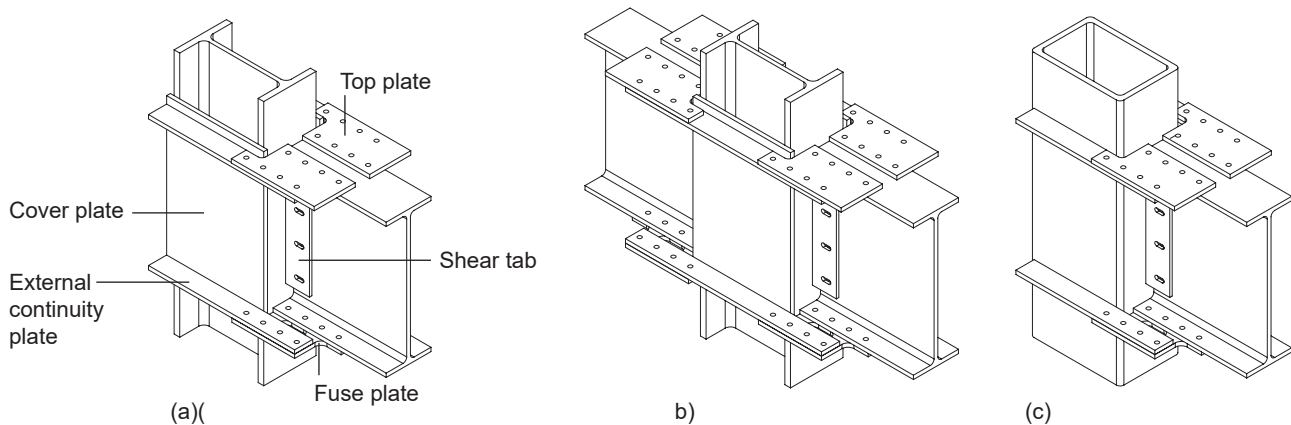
DuraFuse Frames connections (a) one-sided with wide-flange beam and col-umn (b) two-sided with wide flange beams and column (c) wide-flange beam with HSS column (two-sided HSS column connection permitted but not shown.)
